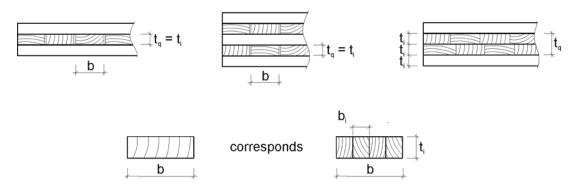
Typical dimensions of cross section of KLH® - CLT lamellas
